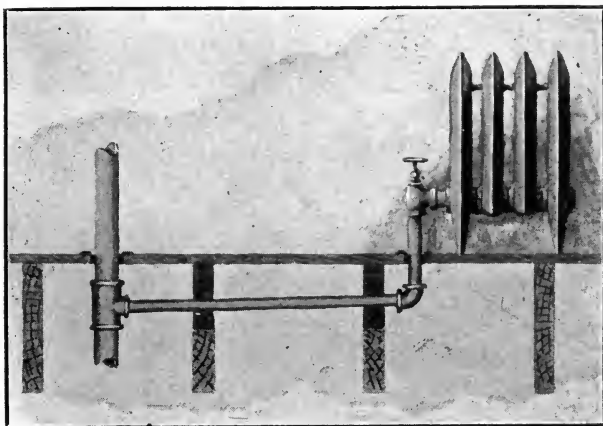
Similar to Fig. 3, with Position of Radiator Changed.
